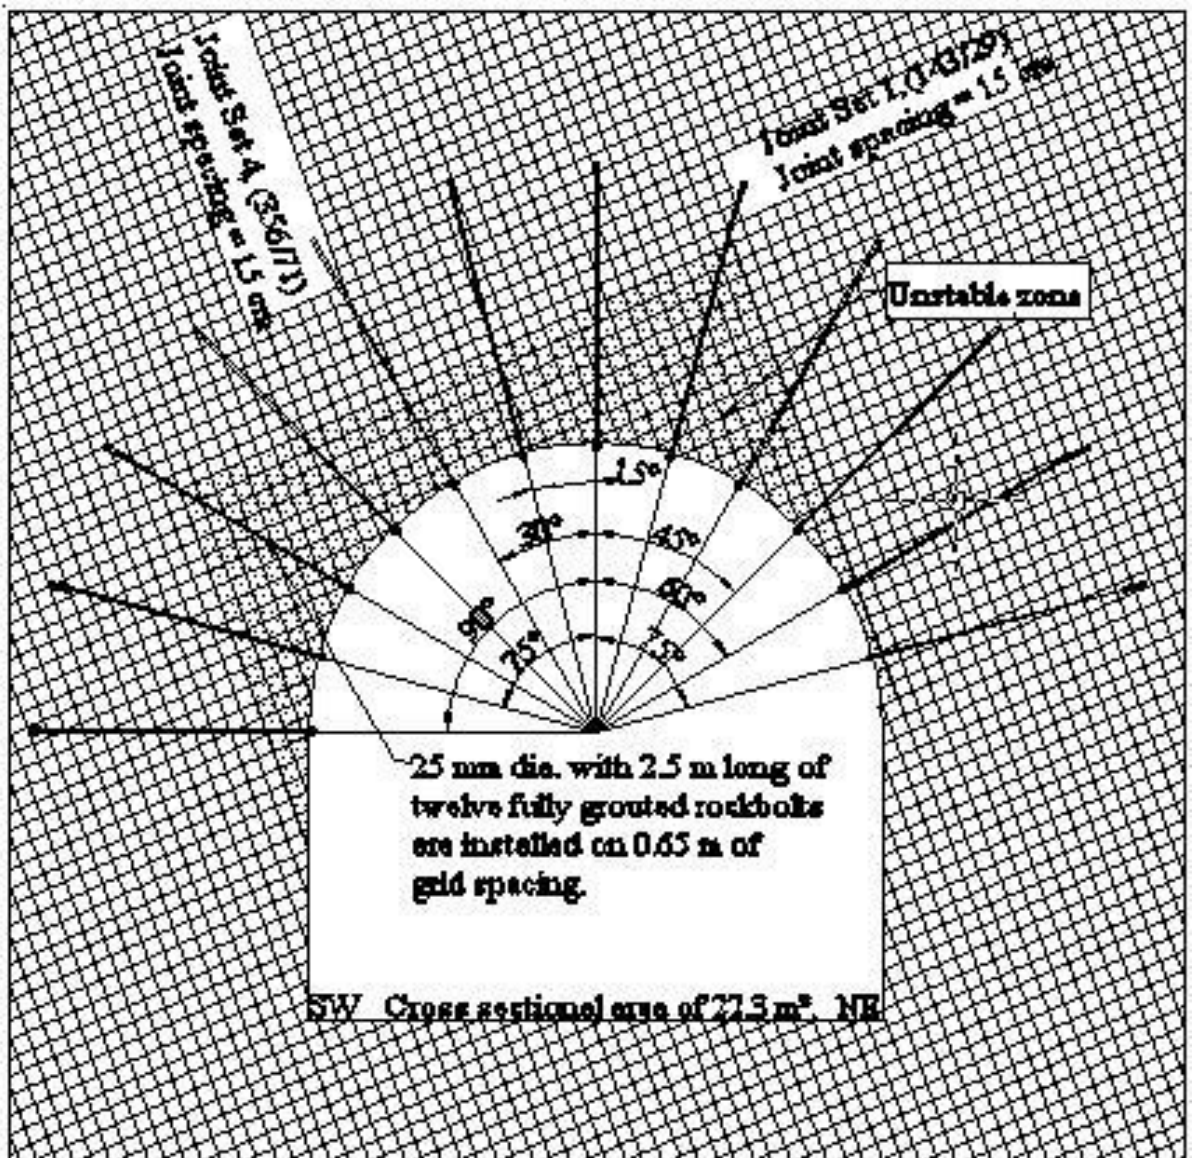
Preliminary layout of rockbolt pattern in access tunnel in footwall high fracturing shale zone.
